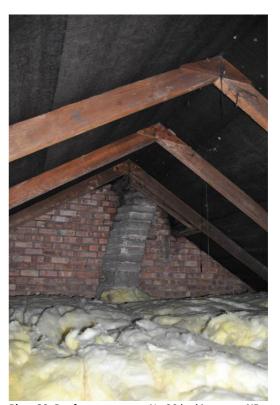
Roof structure over No.30 looking west, NB: concrete block stack angled to rear roof slope.
